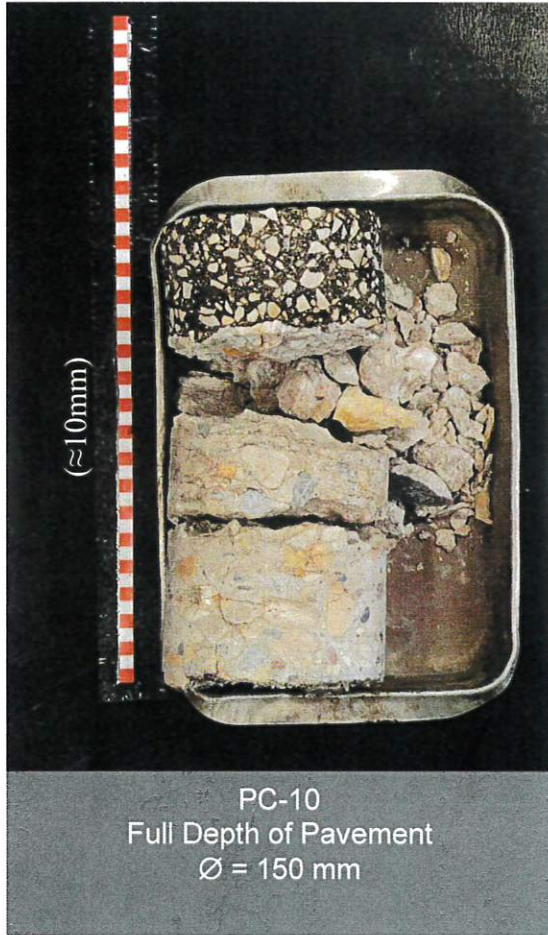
Specimen from Ellice Avenue, Westbound Curb Lane
